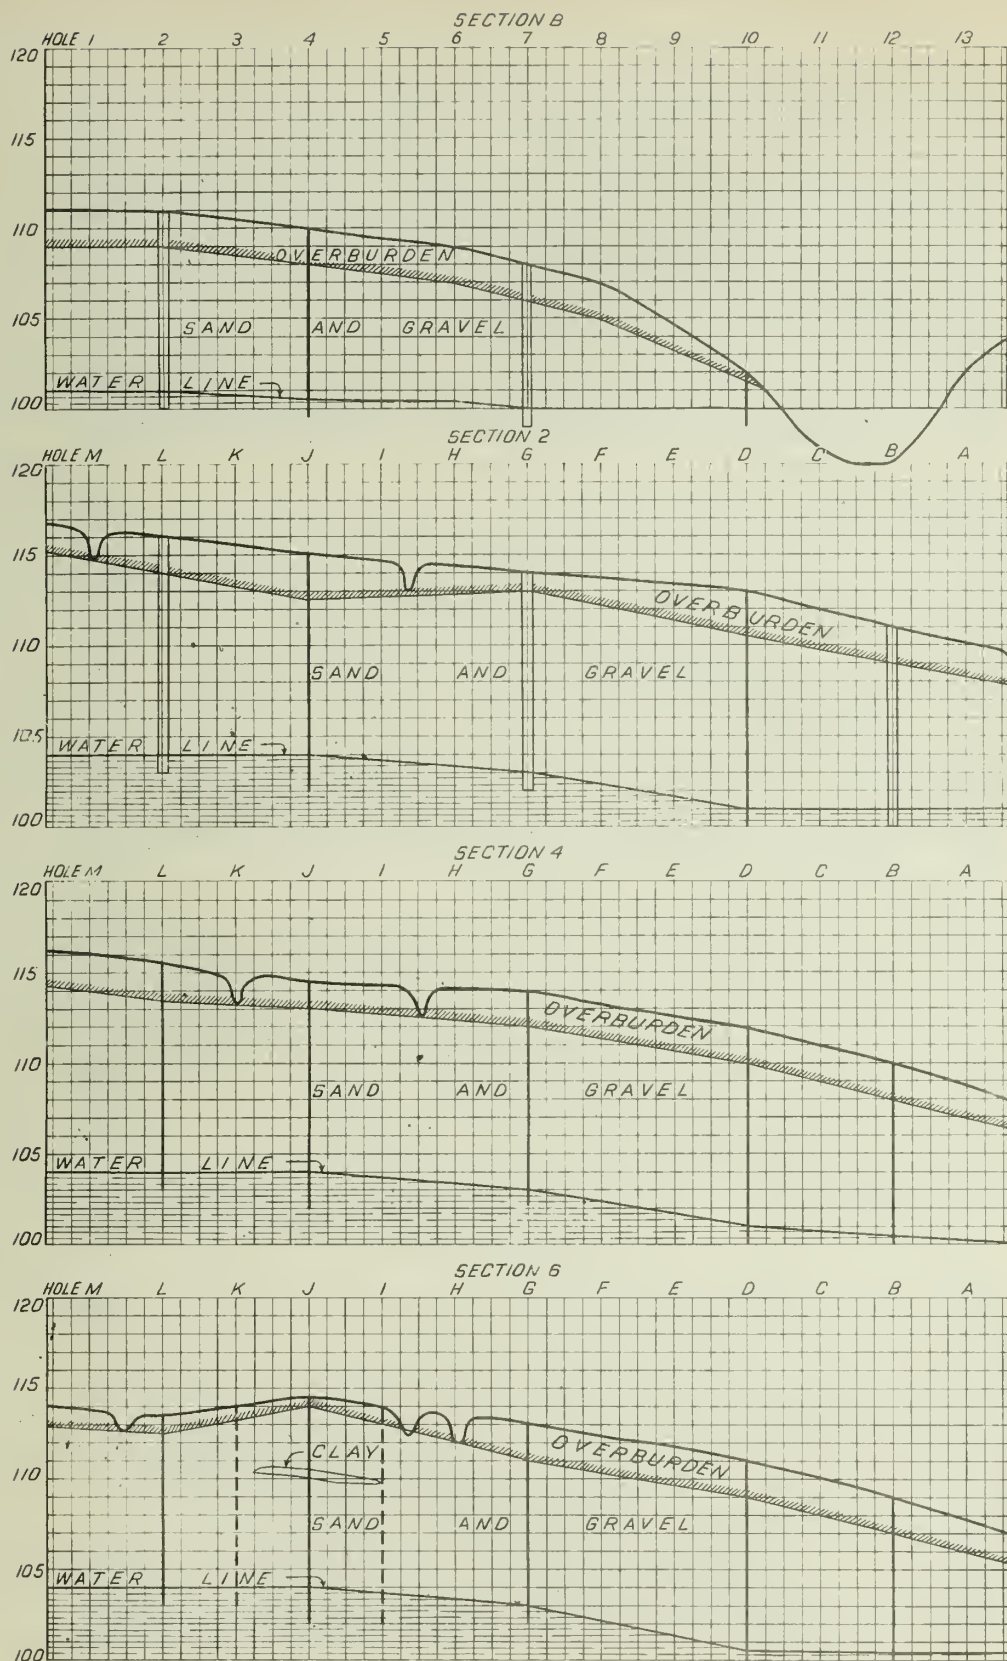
Sections of deposit, showing character of material encountered by test pits and drill holes
